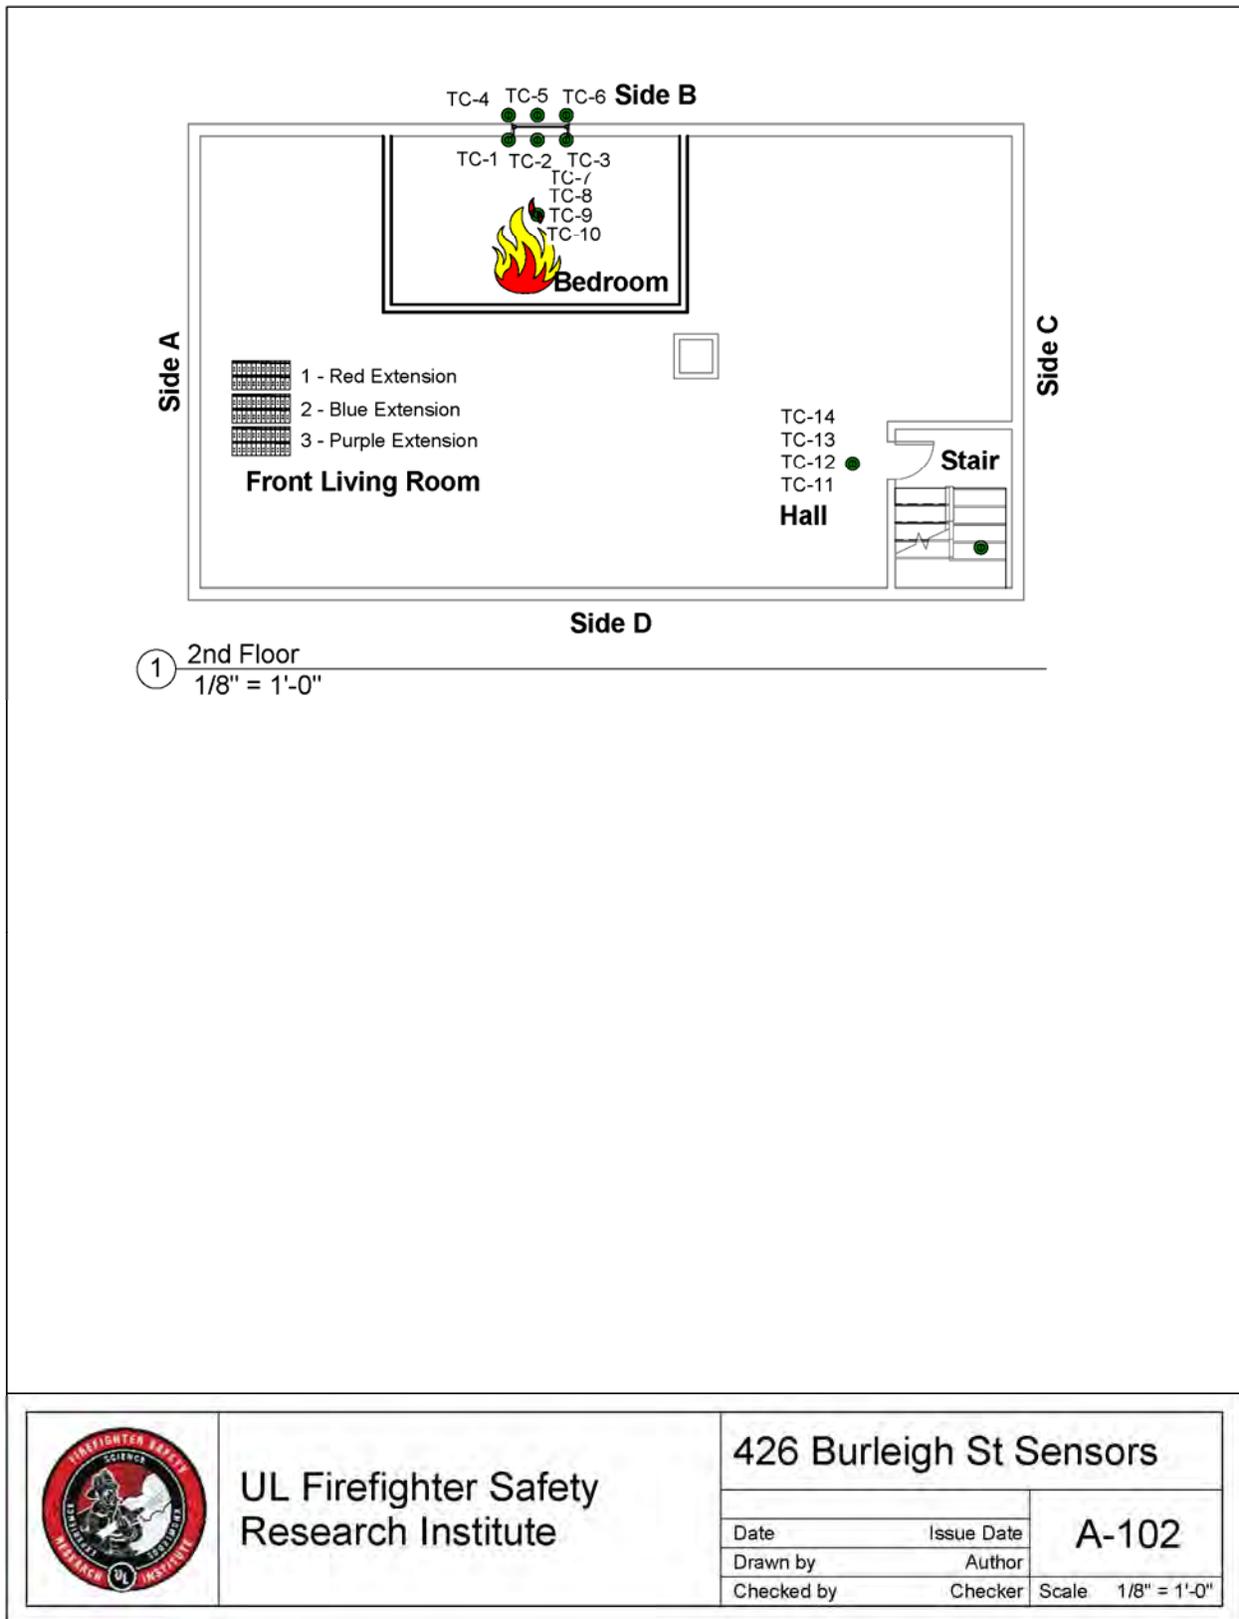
Field Experiment 2 - 426 Burleigh Street Sensors Second Floor Plan
